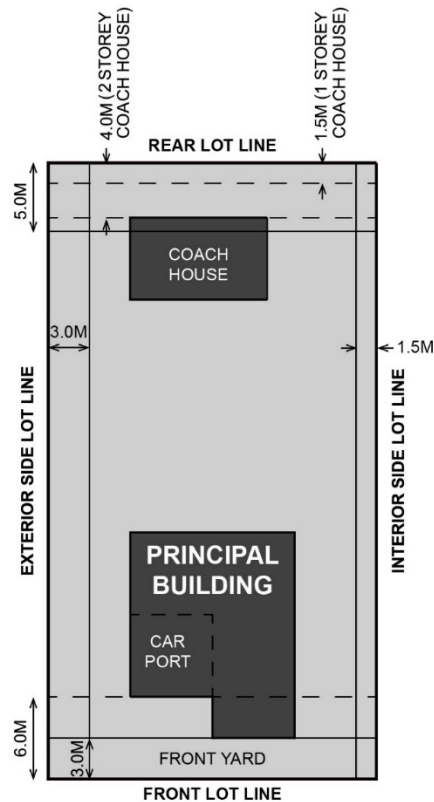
R1.0 Principal Building and SSMFH Coach House Setbacks.
